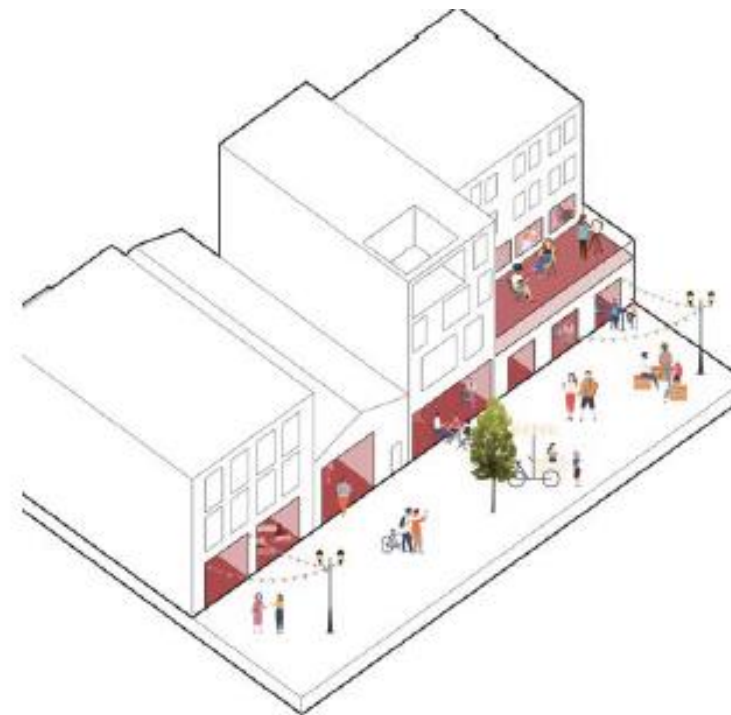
Building frontage activated on ground floor and on terrace to encourage activity on the street and increase surveillance.
